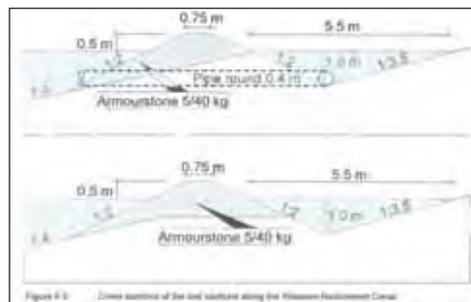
Cross-sections of the test sections along the Willemsoord Canal
